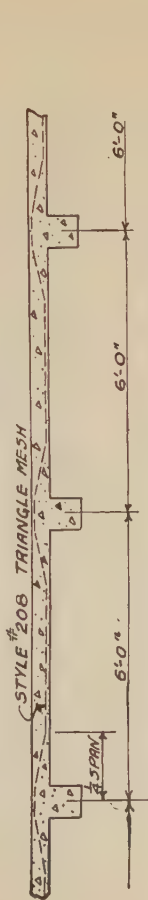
,034.—American section through beam and slabs showing typical mesh design for slabs.
